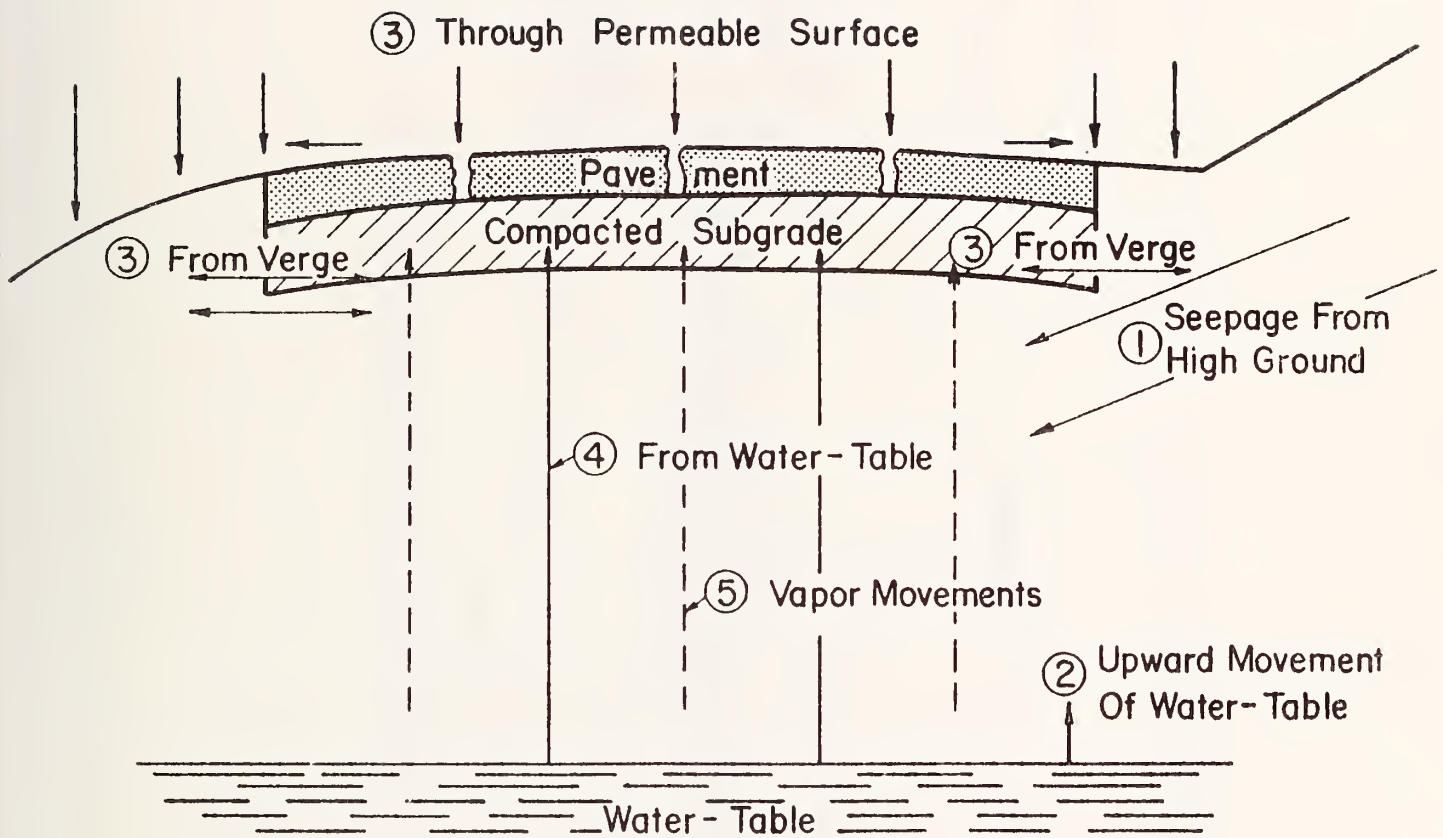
Sources of Moisture in Pavement Systems (21).
